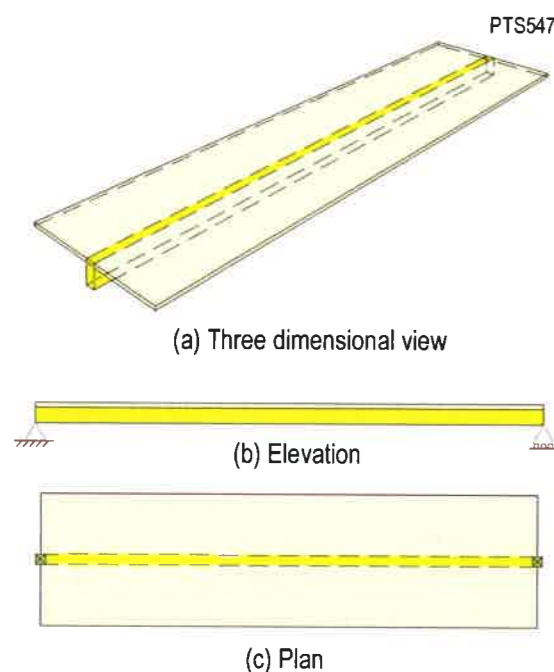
Simply Supported Flanged Beam under Uniform Loading
